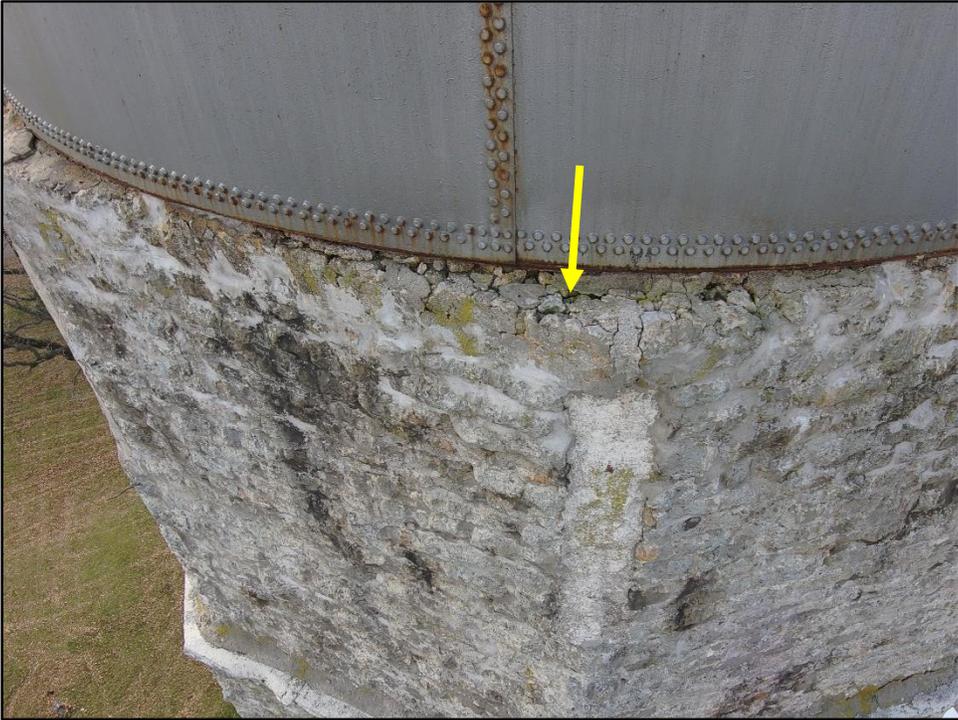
Cracked stones, missing mortar, deteriorating mortar wash
